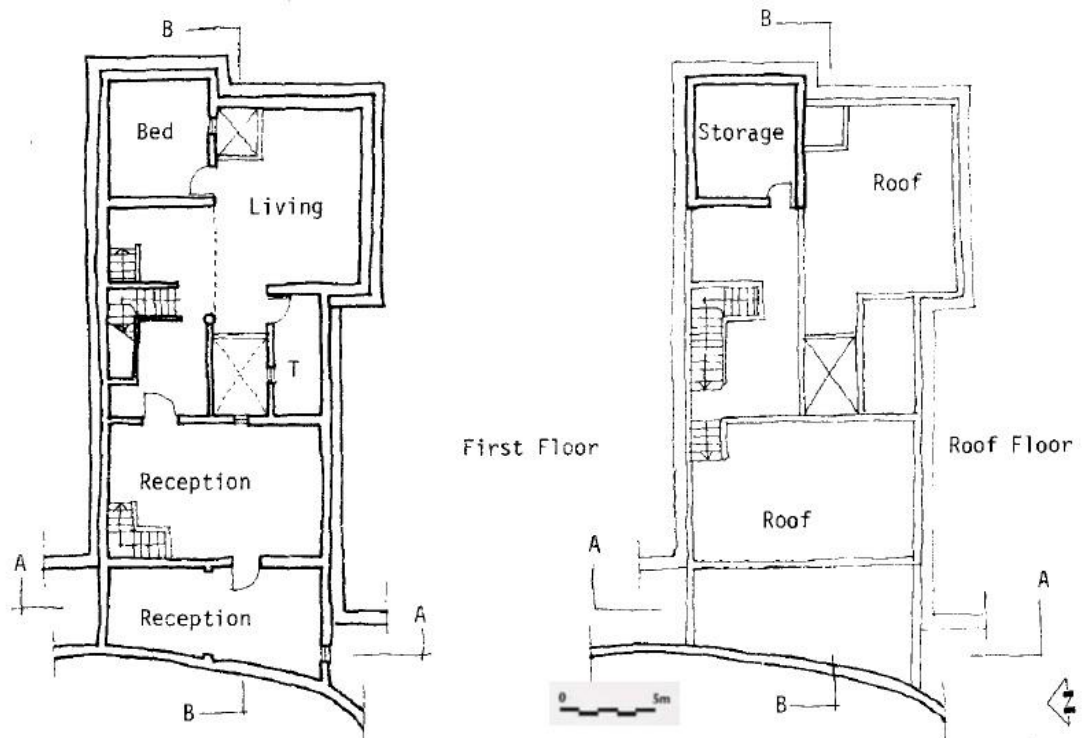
House2 (First floor and roof floor) Riyadh (Akbar, 1977)
